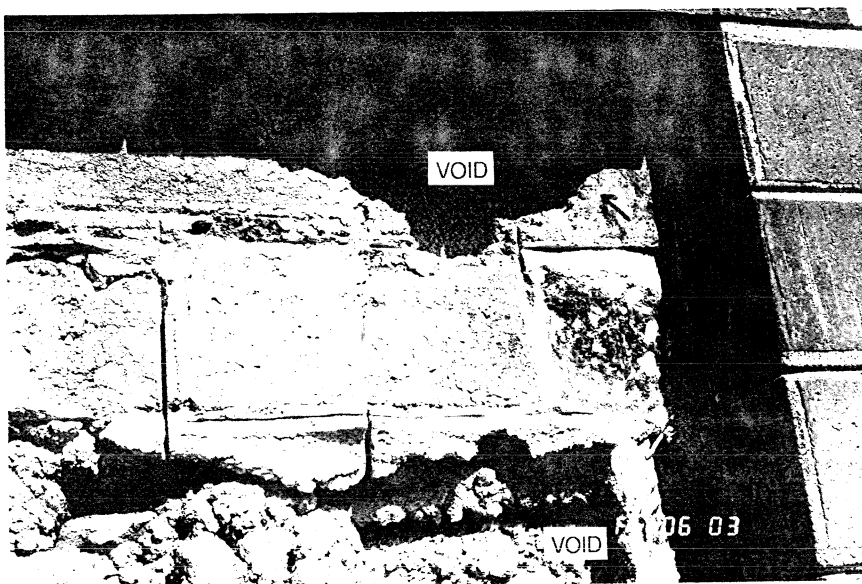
Exploratory opening in a composite brick and concrete masonry wall containing voids in the grouted collar joint.
